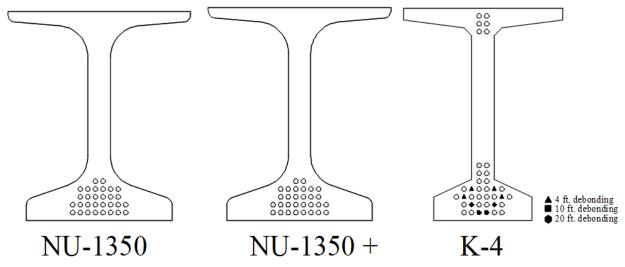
Comparison of NU Girder and K-Girder System with 100-ft Span Length
